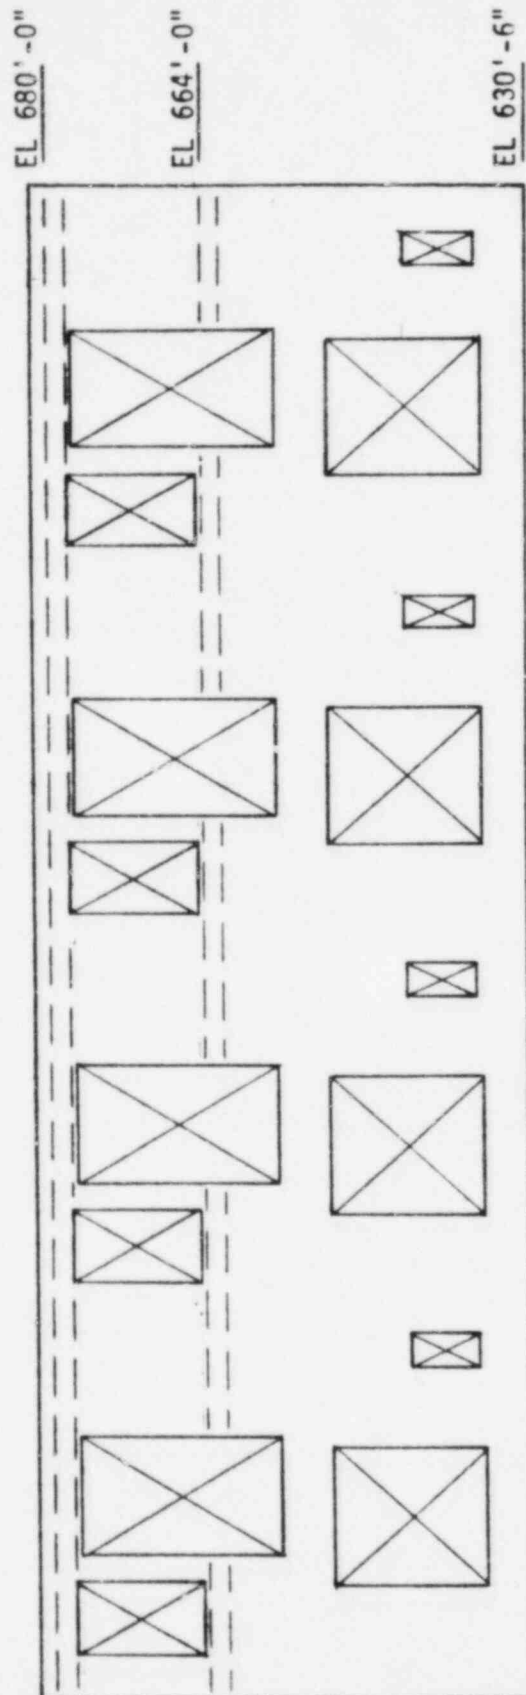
IDEALIZED LAYOUT OF WALLS FROM ELEVATION 630'-6" TO ELEVATION 664'-0" INCLUDED IN LOAD DISTRIBUTIONS
